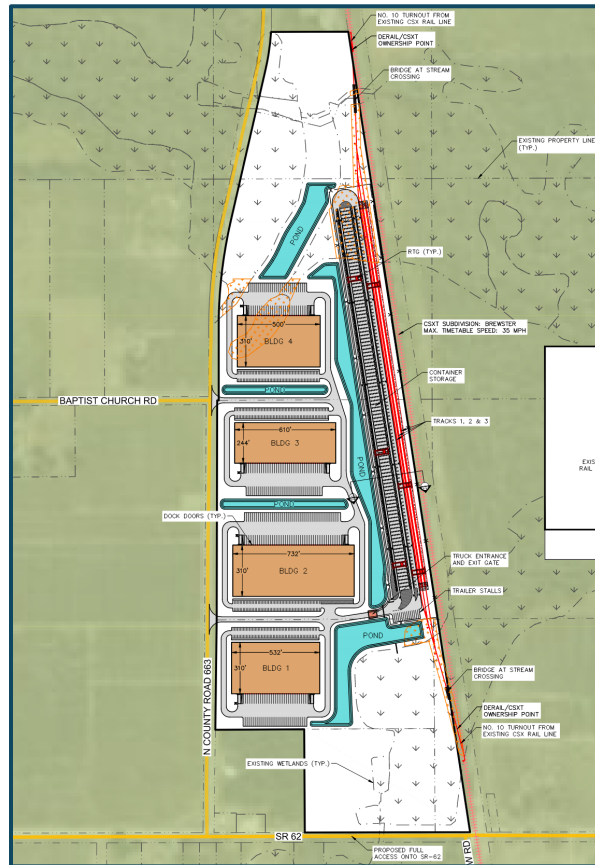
Site 2 Intermodal Conceptual Site Plan
